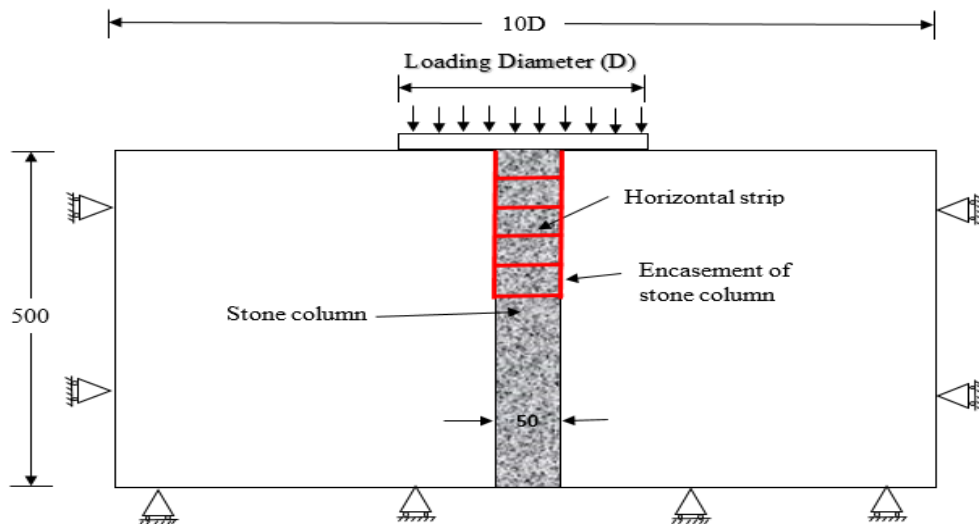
A schematic view of loading plan of encased stone column with horizontal circular strips
